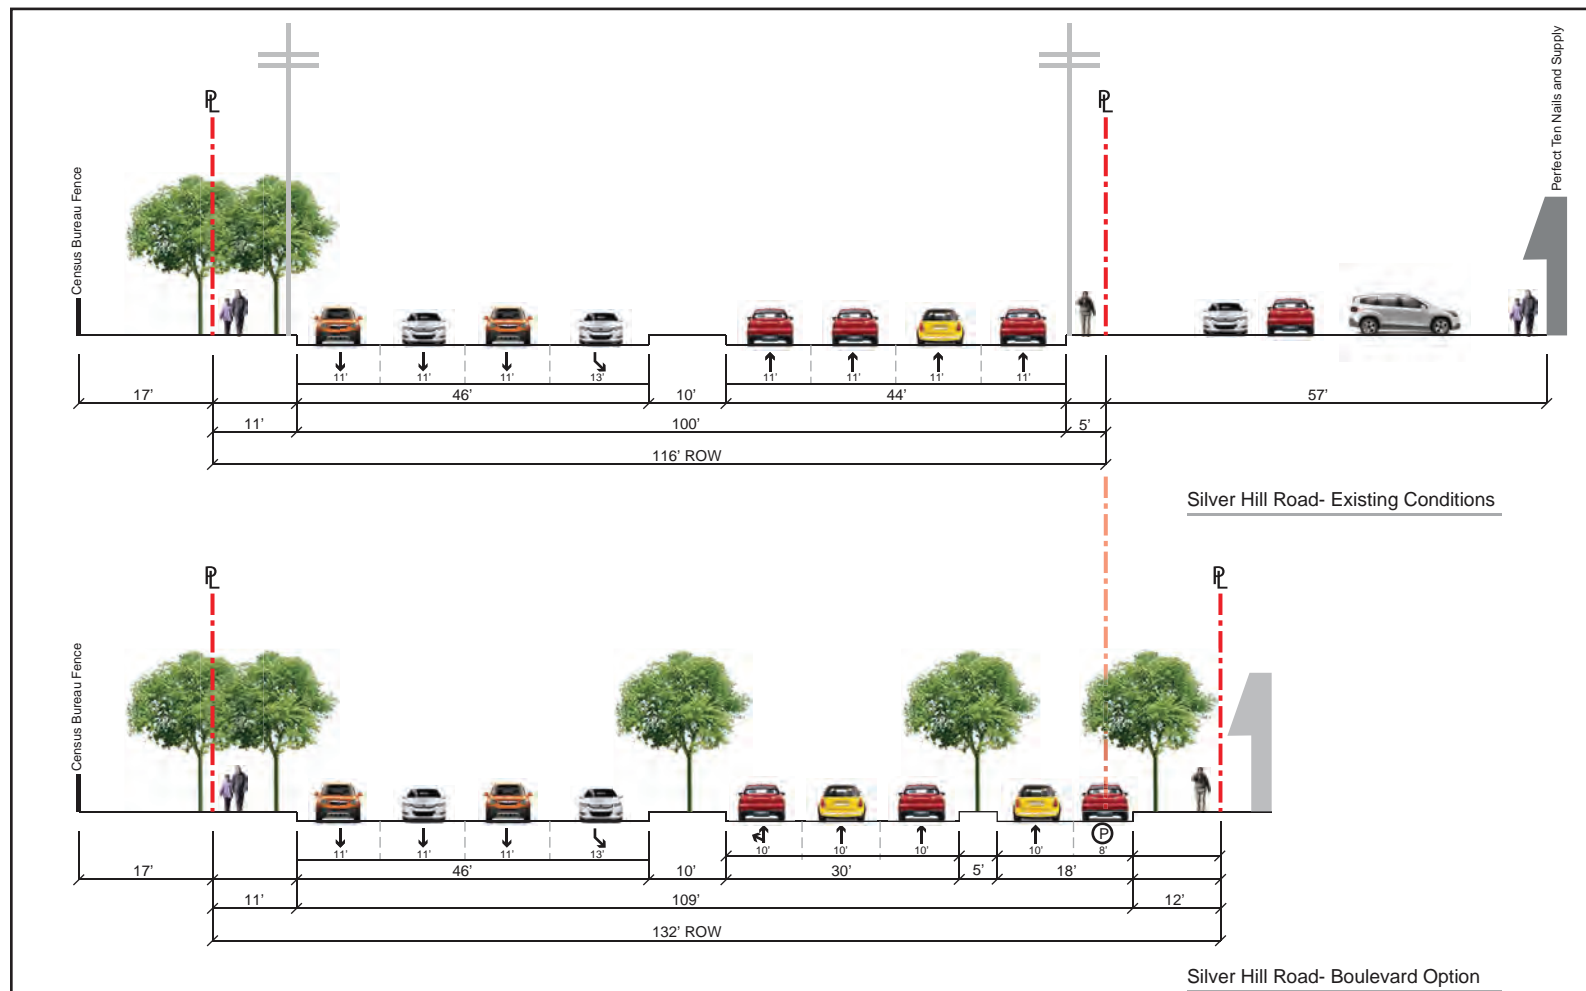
Silver Hill Road Multi-way Boulevard Illustrative Concept Section
